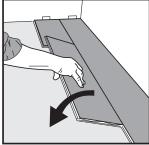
Second row, second plank. Place the plank tight against both the short end of the first plank and repeat the installation steps under Fig 7.
